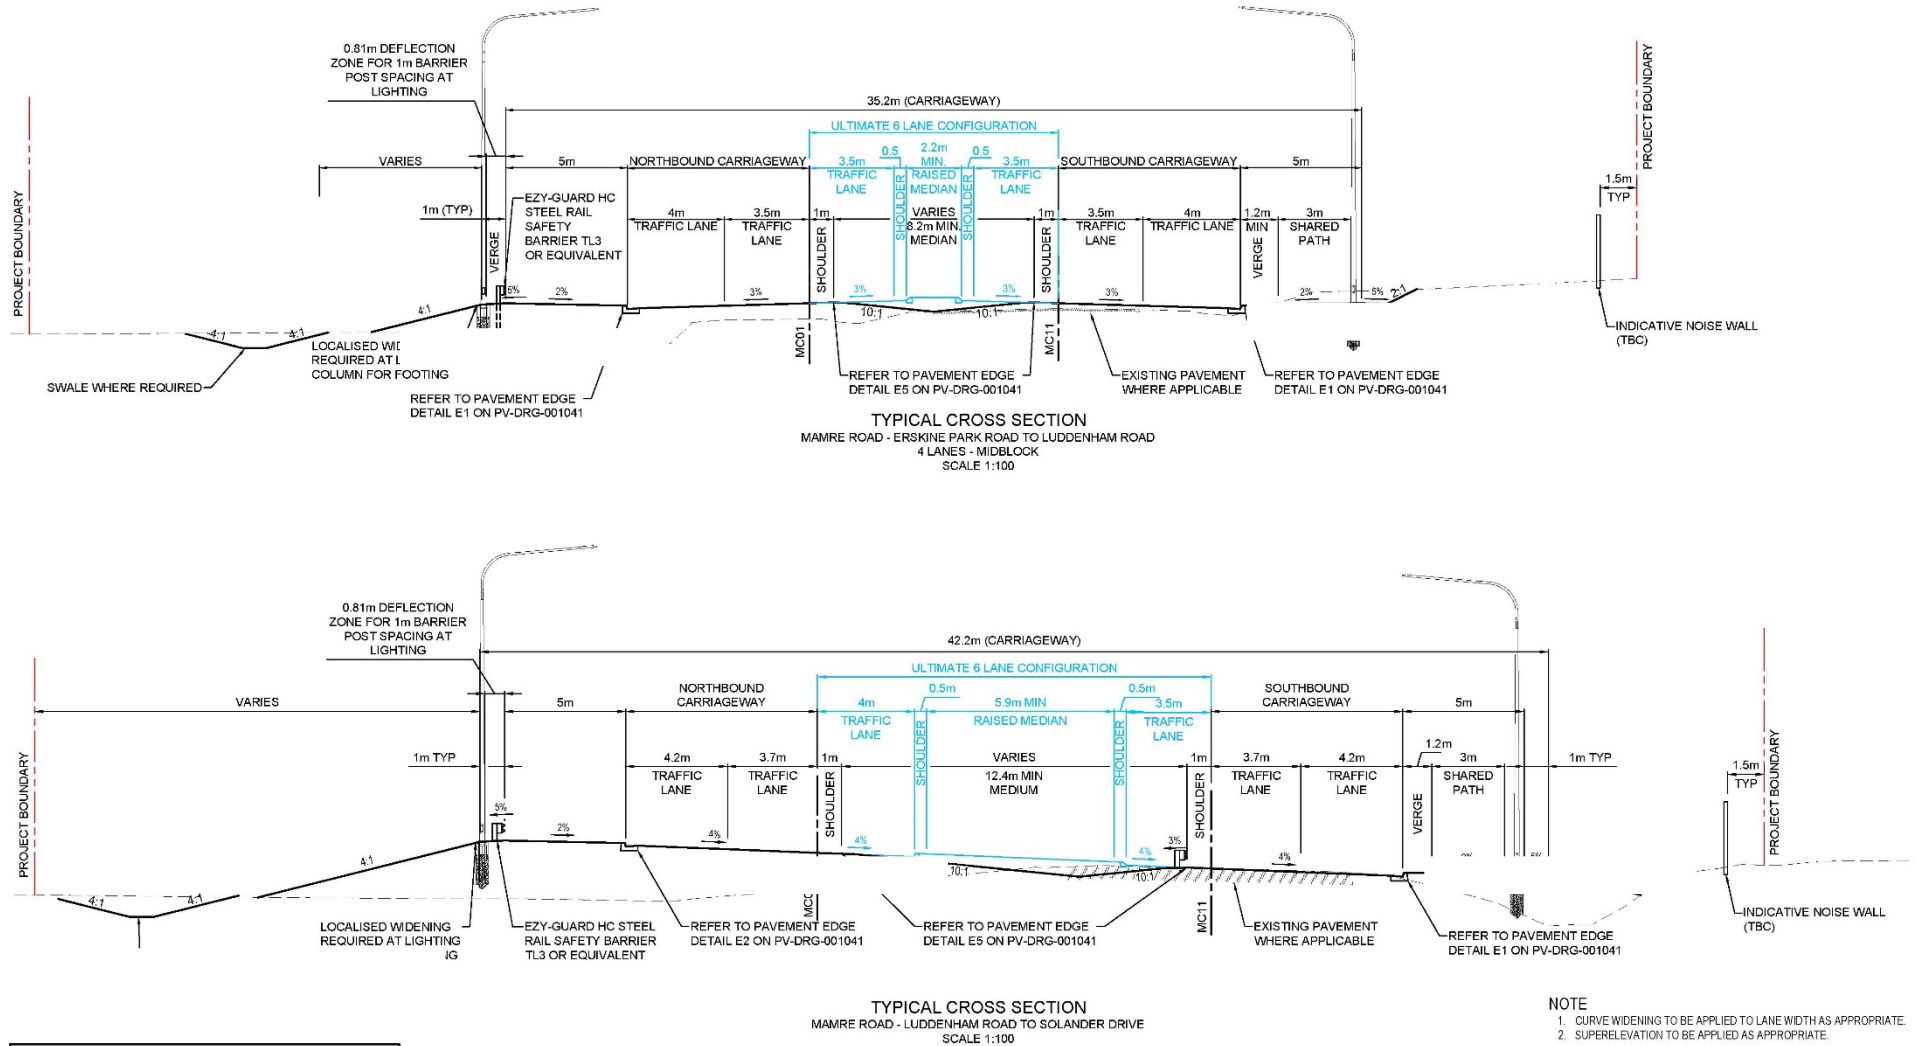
Typical cross sections of Mamre Road between Erskine Park Road and Solander Drive (between intersections) after being upgraded by the proposal
